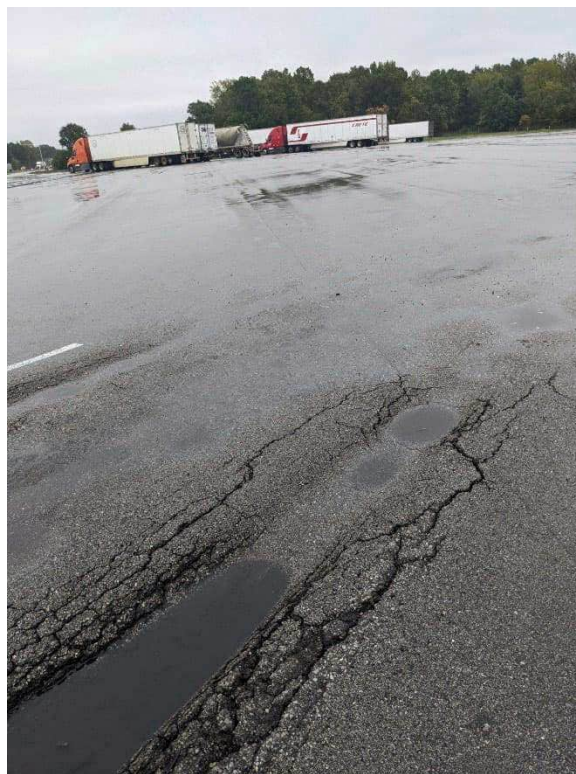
Typical pavement condition in eastbound truck parking plaza (south side of ITR).
